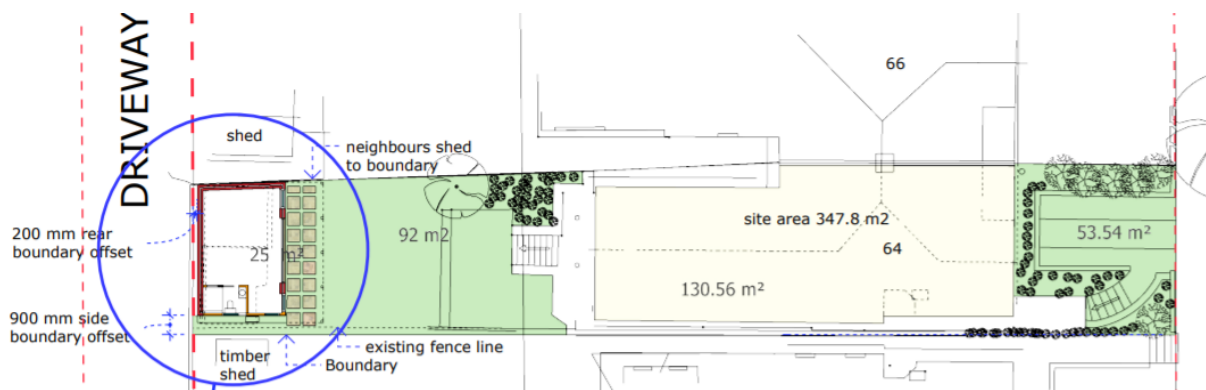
Site Plan (Dwg 1 dated 14 October 2021)
